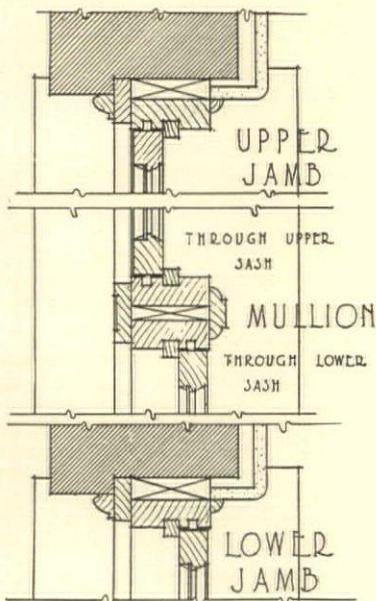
DETAIL "B" AN AUSTRAL FRAME ADAPTED TO STONE WITH HARD WOOD INTERIOR FINISH.
